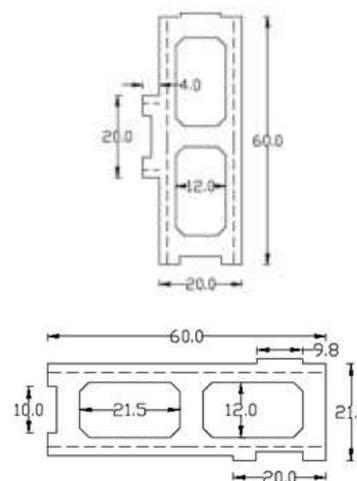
Plan and Inner Vertical Bonding Face of Interlocking Hollow Block
